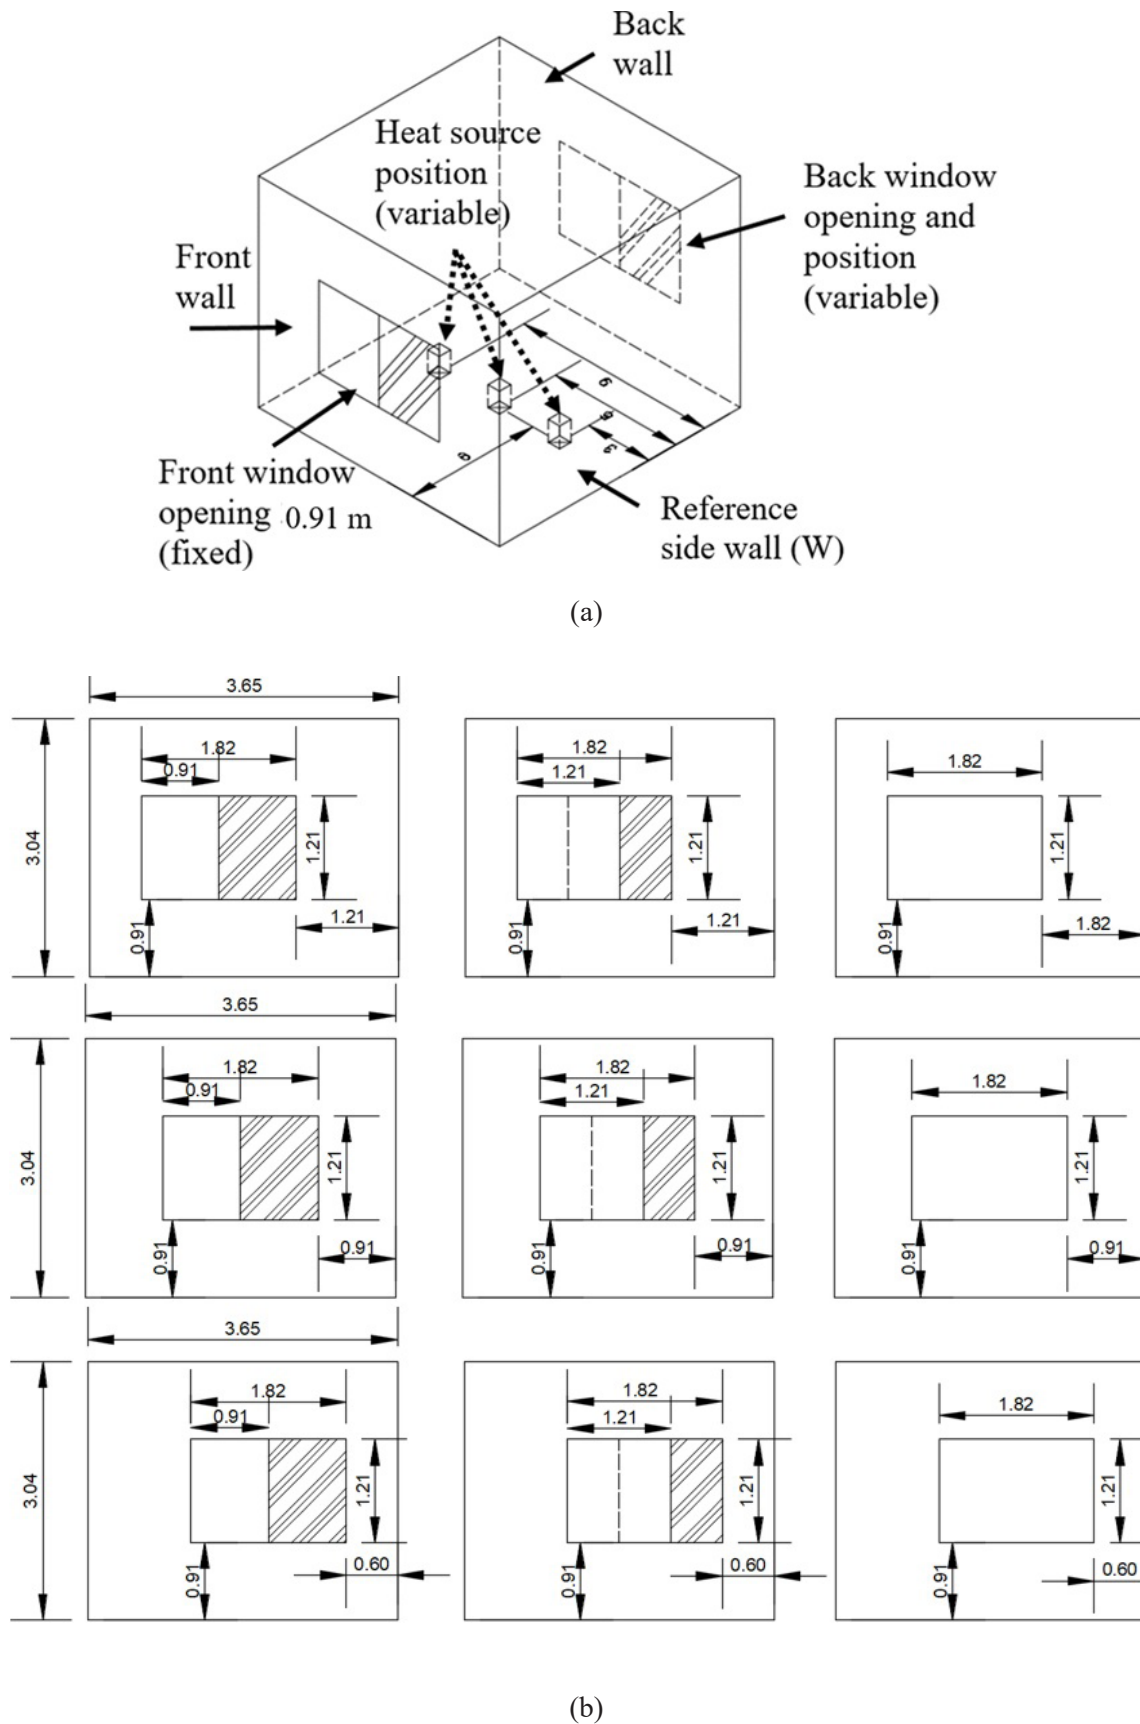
(a) Isometric view of the generic cross-ventilated house (b) Various openings and positions of the rear wall window, looking from the front wall (all dimensions are in meter)
